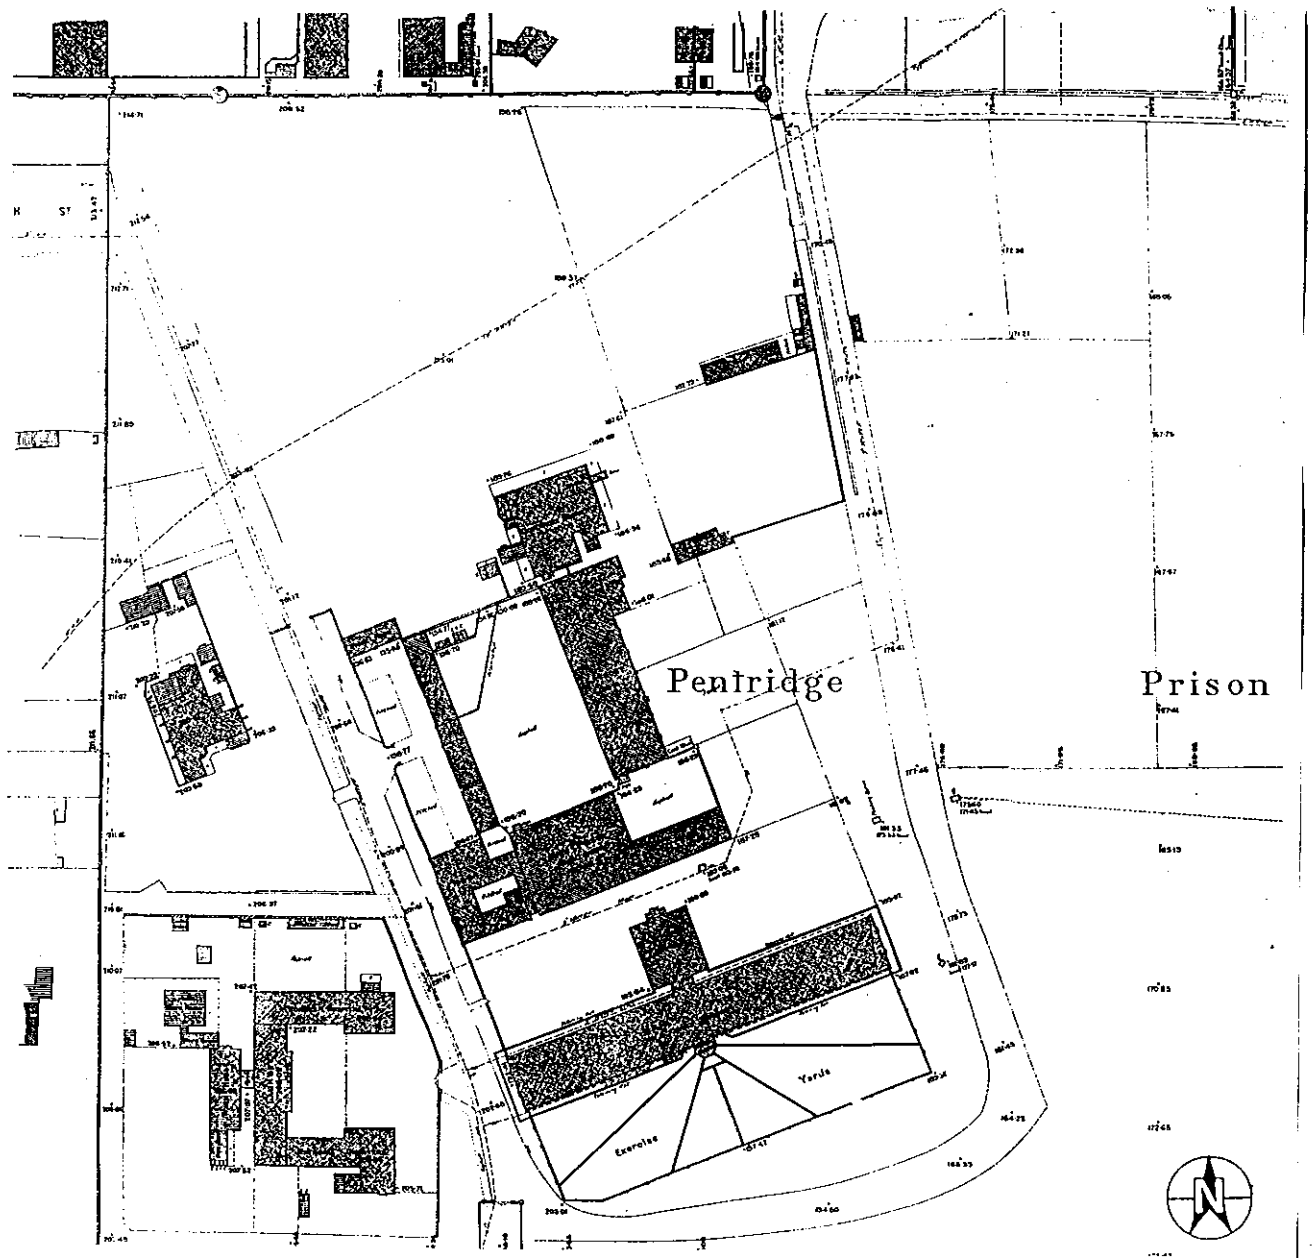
This 1919 plan shows the Female Prison as constructed in the 1890s.
